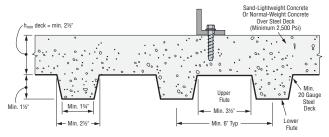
Installation of 1/4" Diameter Anchors in the Topside of Concrete over Metal Deck
